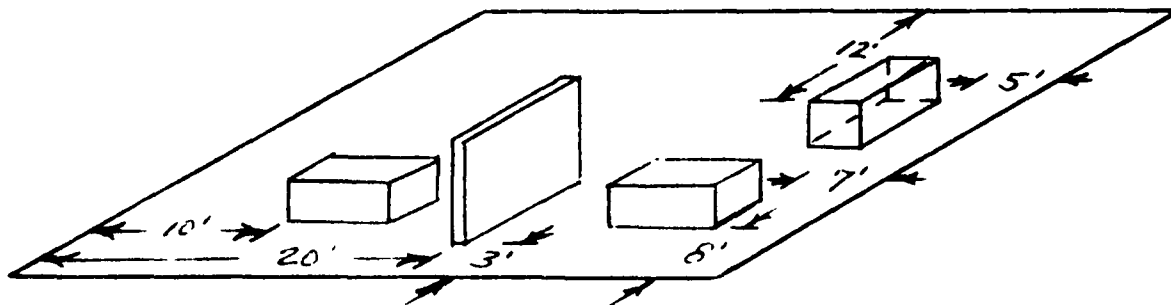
Room layout for Example 12. Walls and ceiling are not shown. Task locations are on the three desks.
